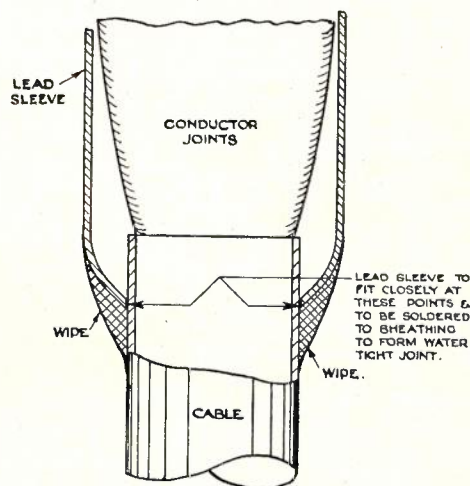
Showing method of Fitting and Wiping Lead Sleeve to Lead Covered Cable.
